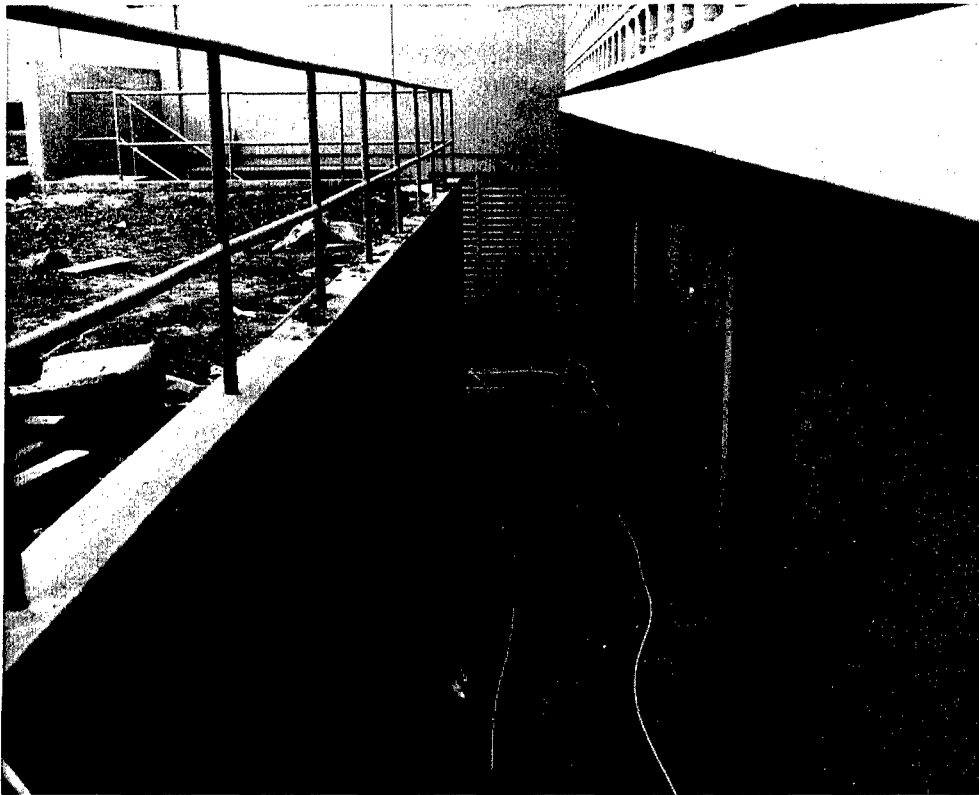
Tubing layout in large areaway at UCLA structure.
